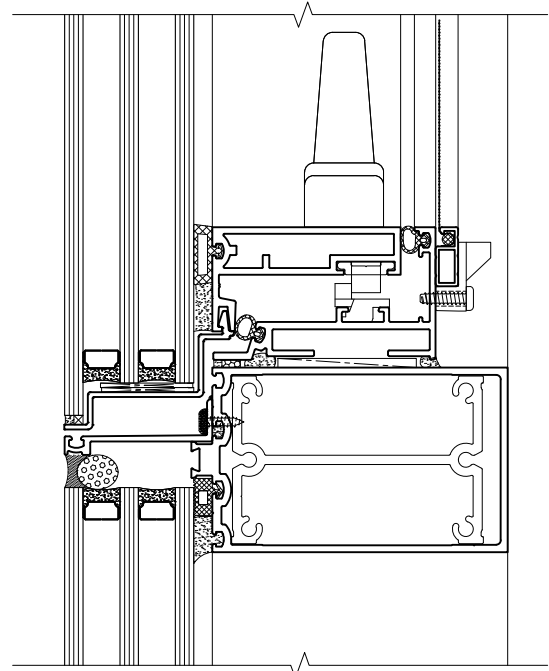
DETAILS SHOWING PROJECT OUT PHANTOM VENT WINDOW INSTALLED INTO THERMAWALL 2600
